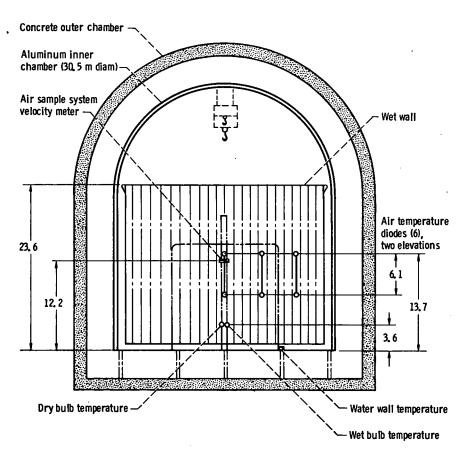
Elevation view showing placement of part of instrumentation in space power facility.
